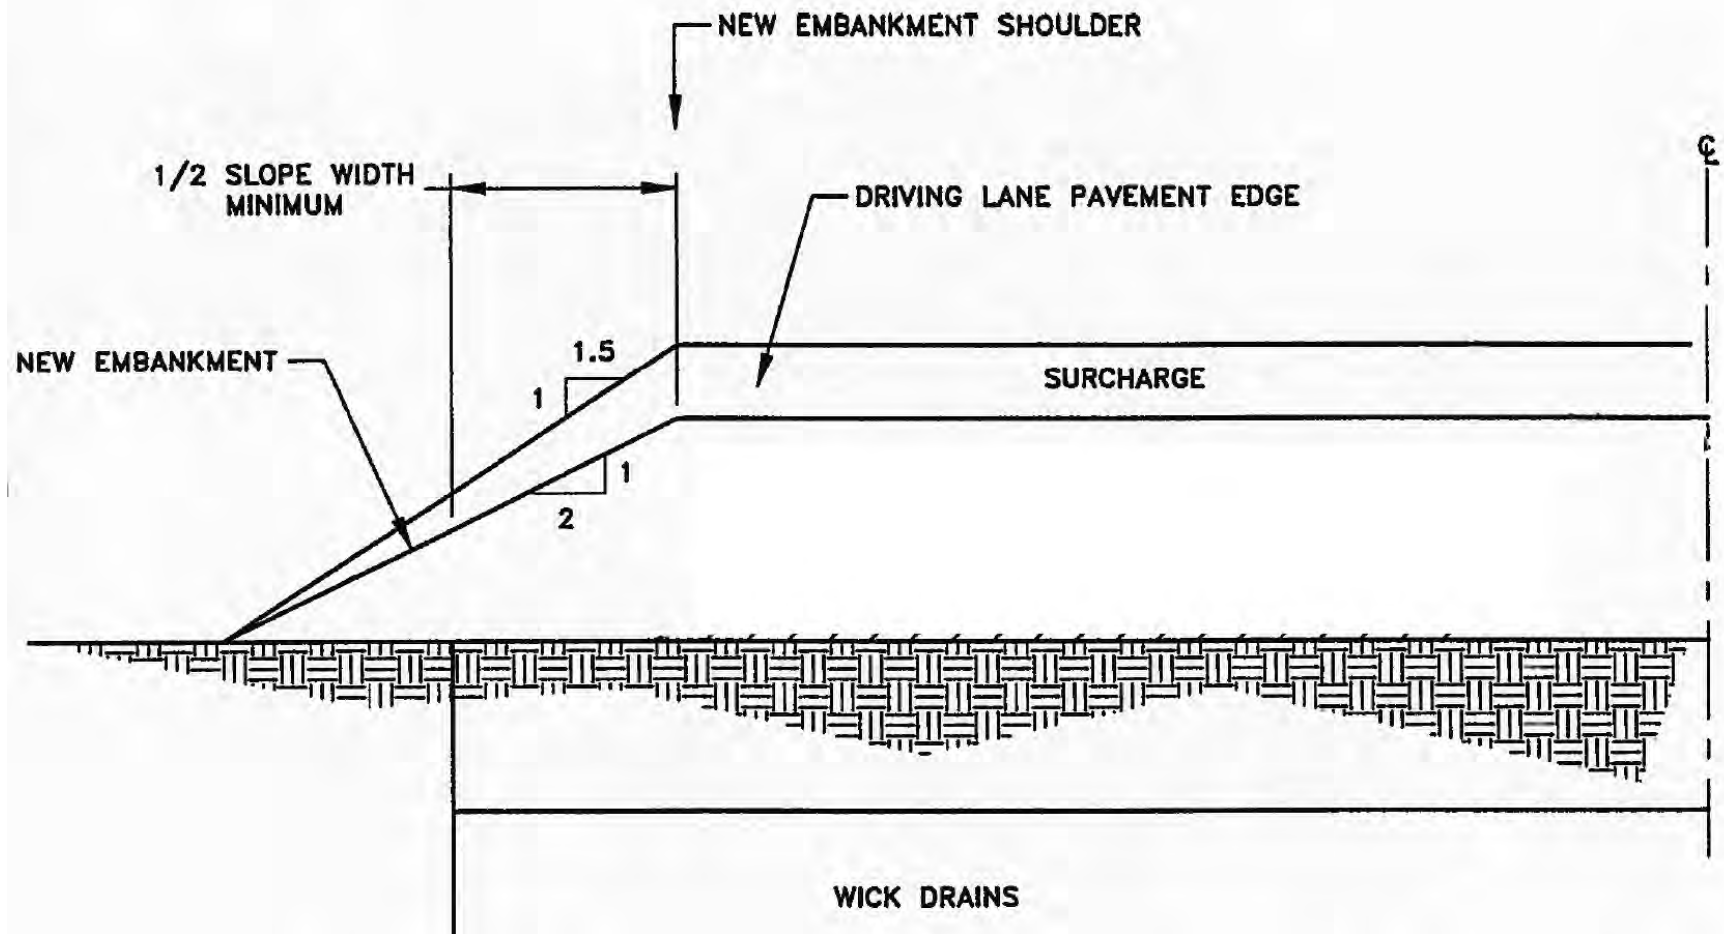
Recommended surcharge layout for new embankment. Wick drains may be optional depending on project schedule constraints.
